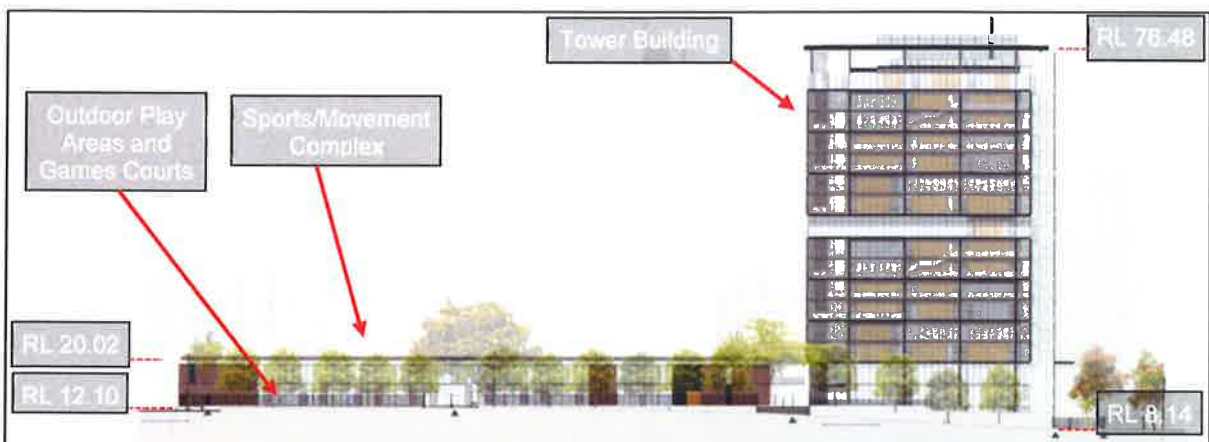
APHS Macquarie Street (Southern) Elevation (source: Applicant)
